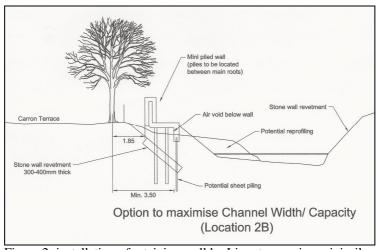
installation of retaining wall by Lime trees using mini-piles. Note: potential use of sheet piling
